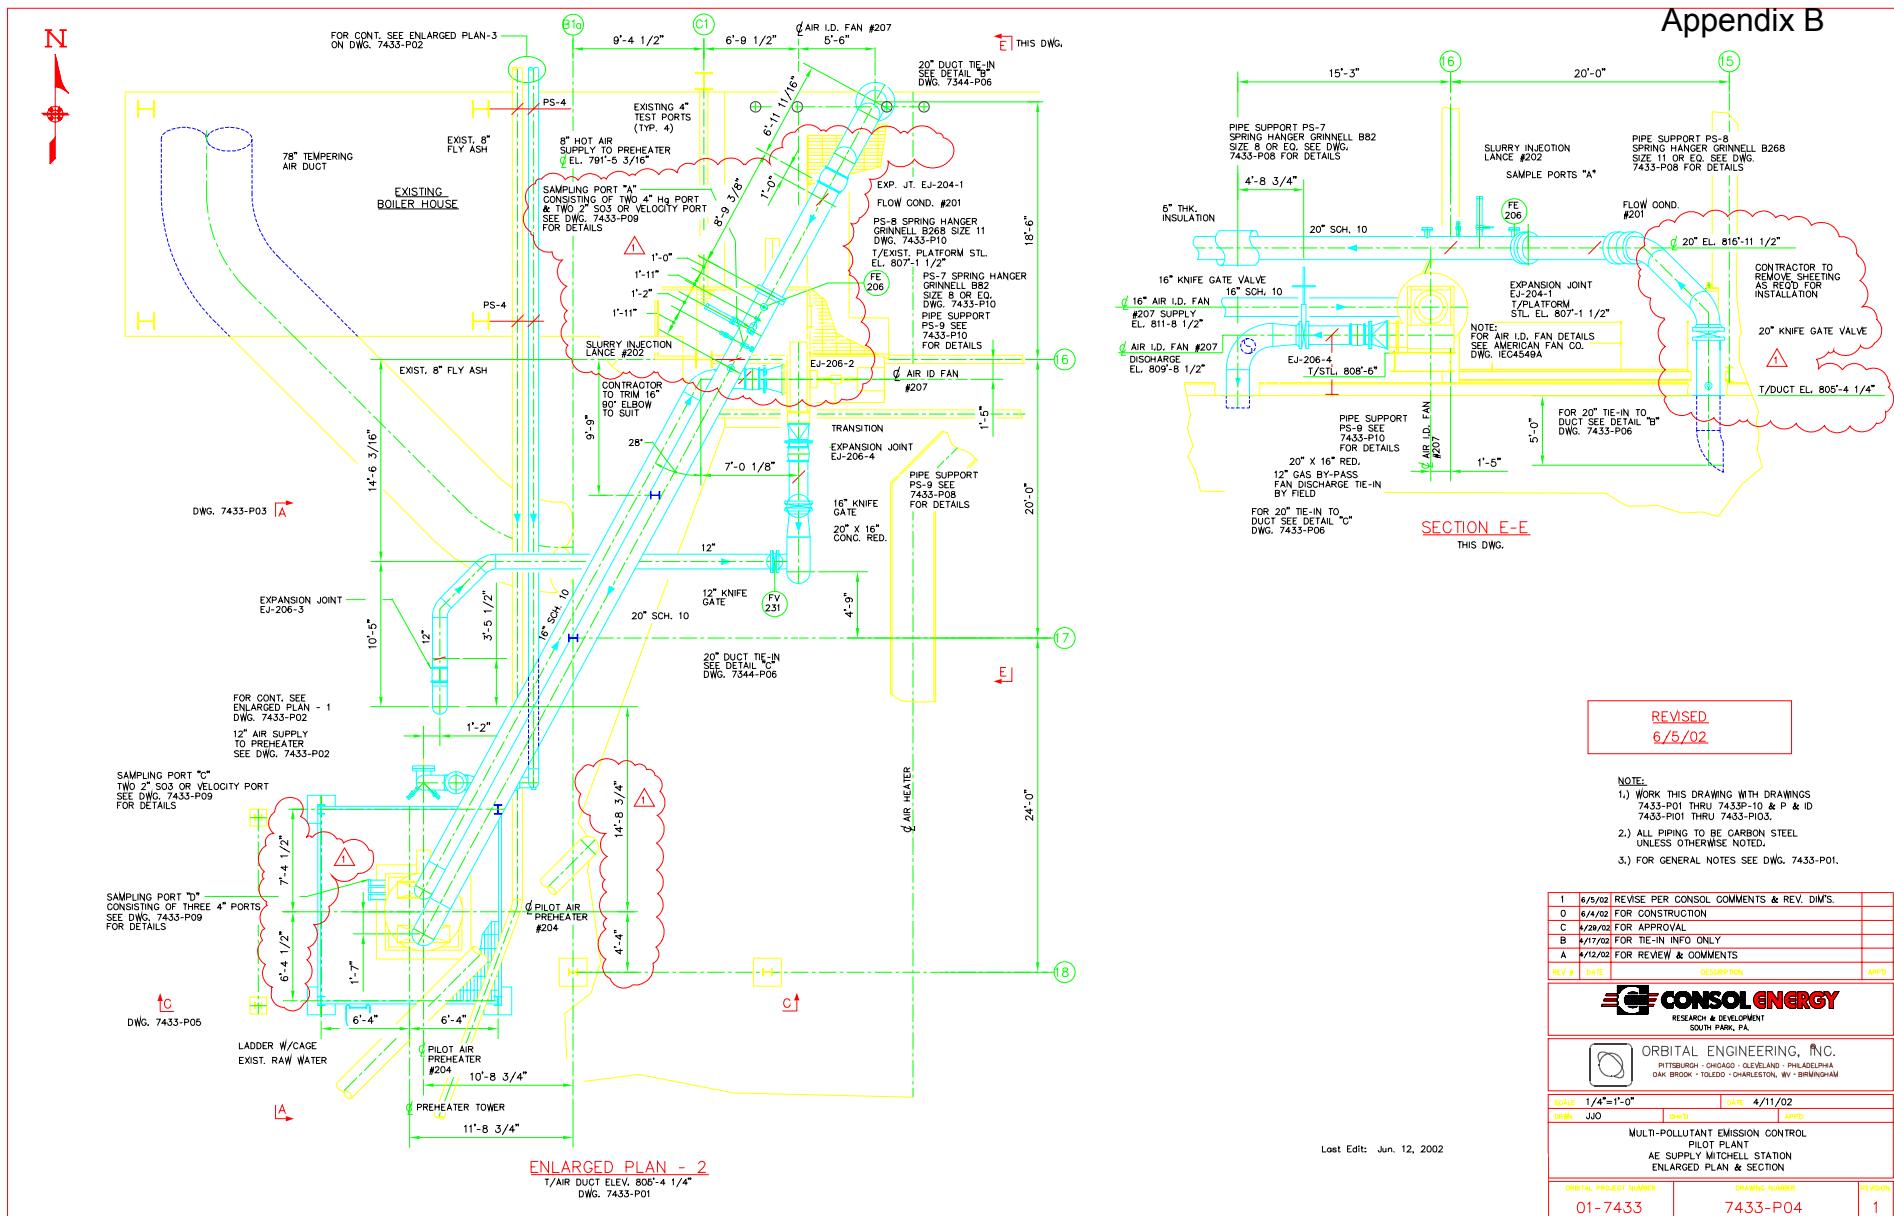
General Arrangement & Piping, Enlarged Plan & Section Views
